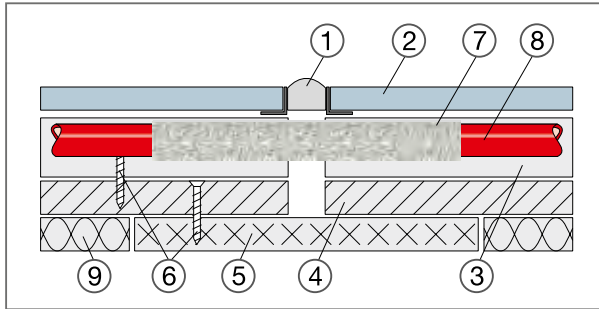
Section: Floor sub-construction on insulation and plasterboard construction panel
